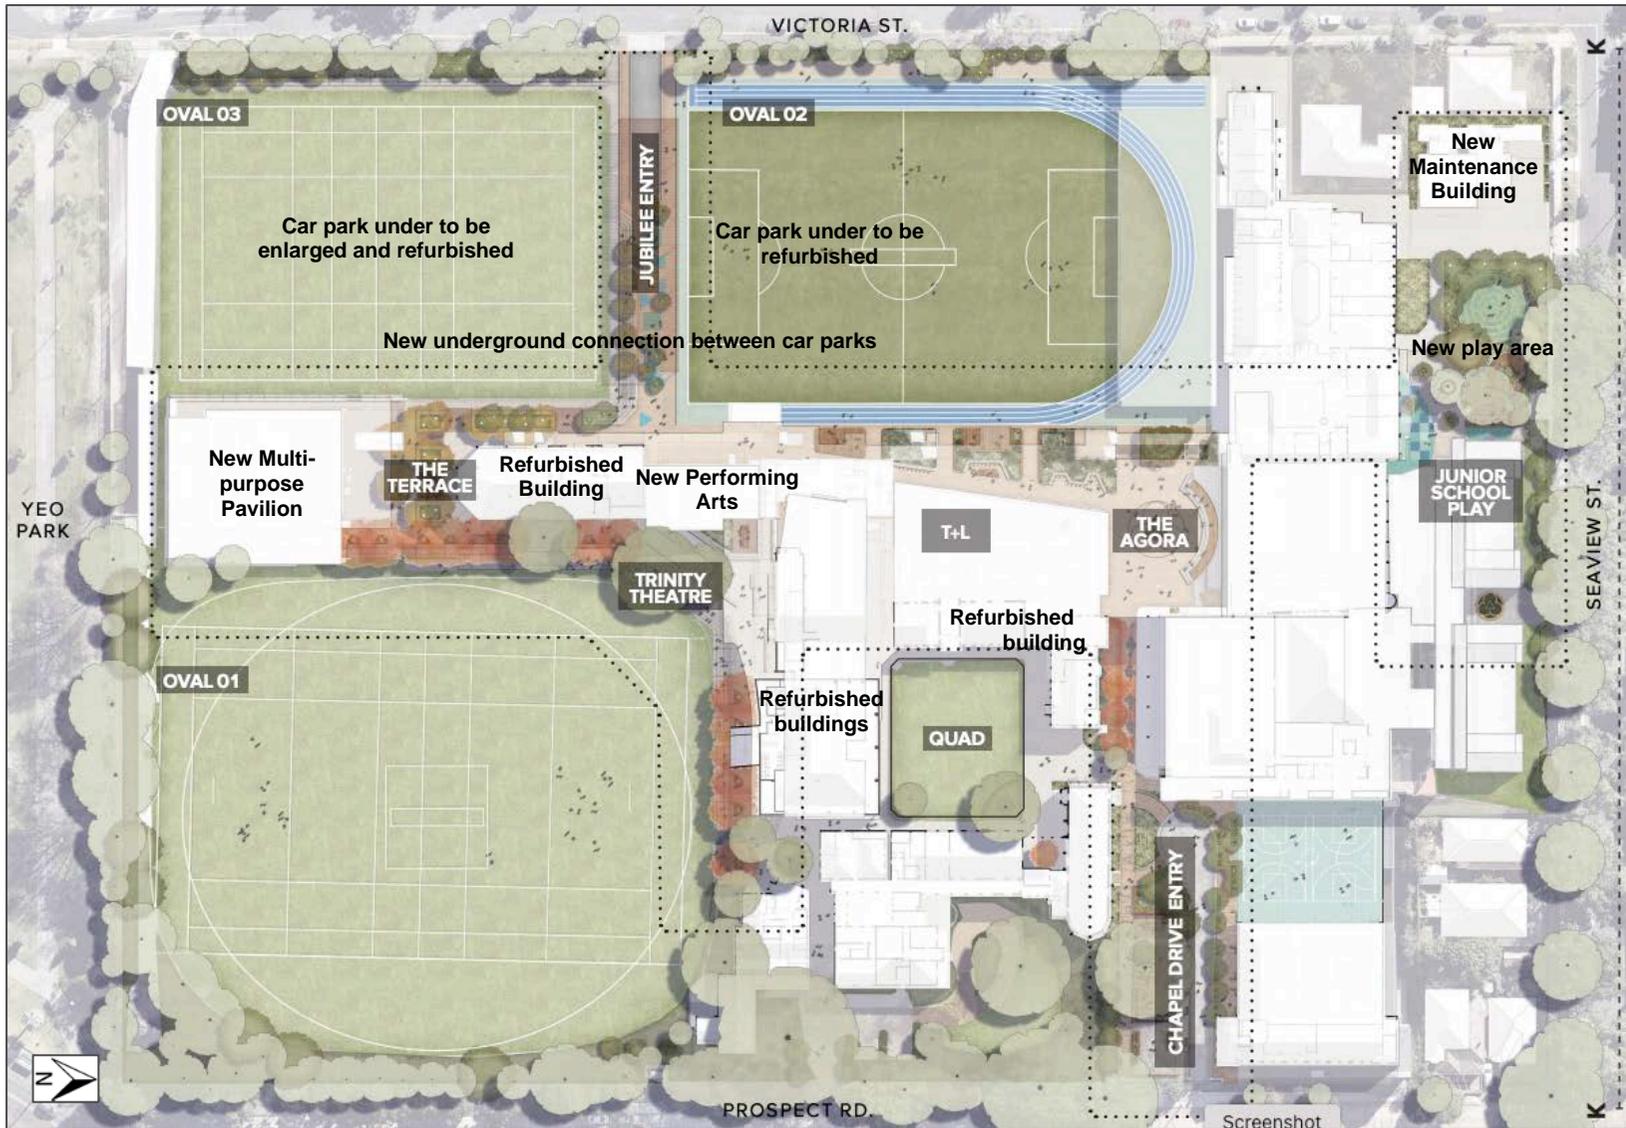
| Extract from landscape plan showing proposed site layout (Source: Applicant's RtS 2020)
